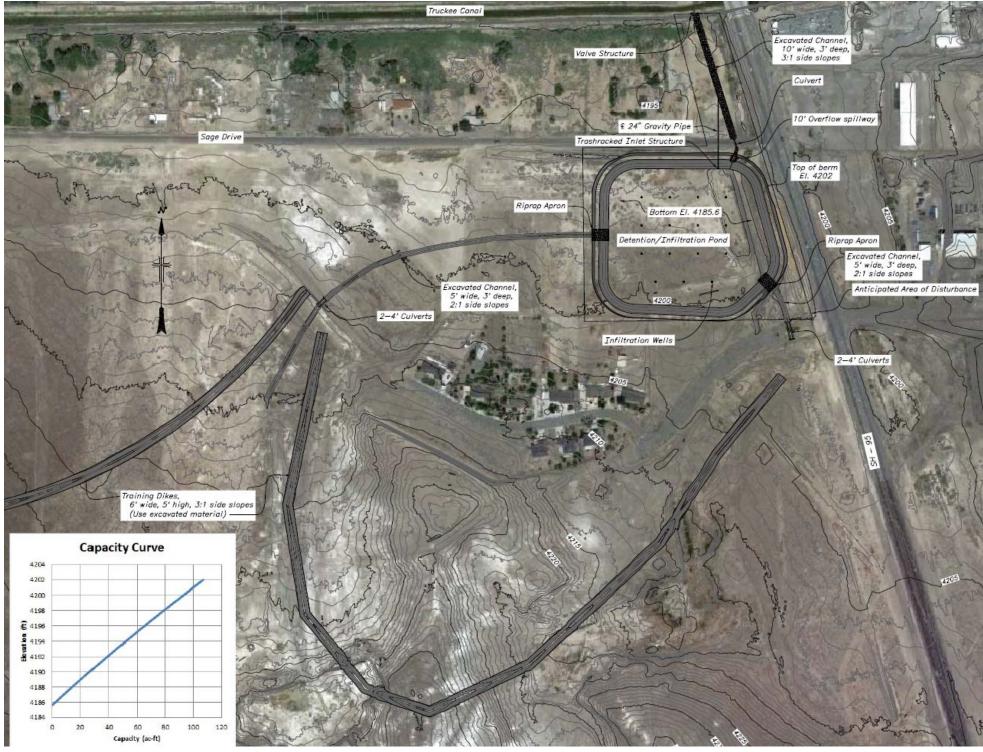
Detention Pond Site Plan at Pour Point 8
